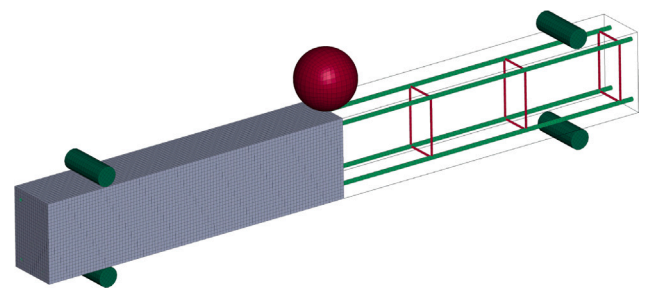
Representative finite element model used in study (note: concrete elements hidden on one side of beam to show reinforcement).
